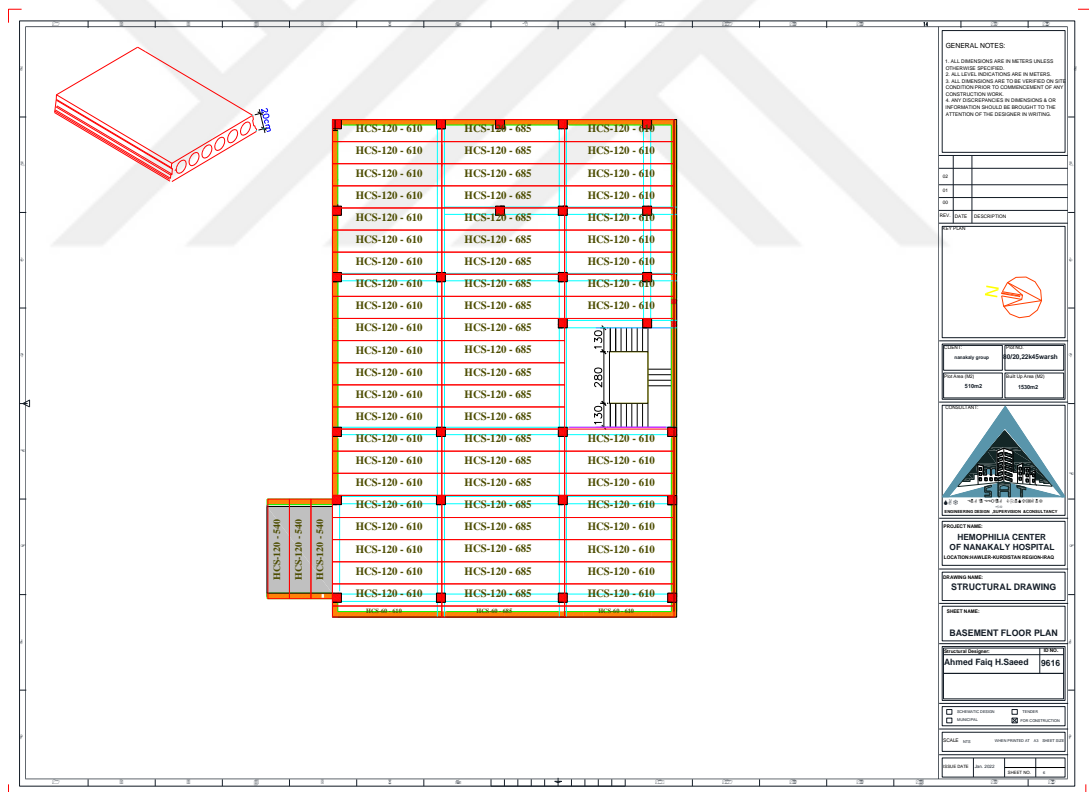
Distribution of HCS Panels for Basement Floor of Erbil Building
